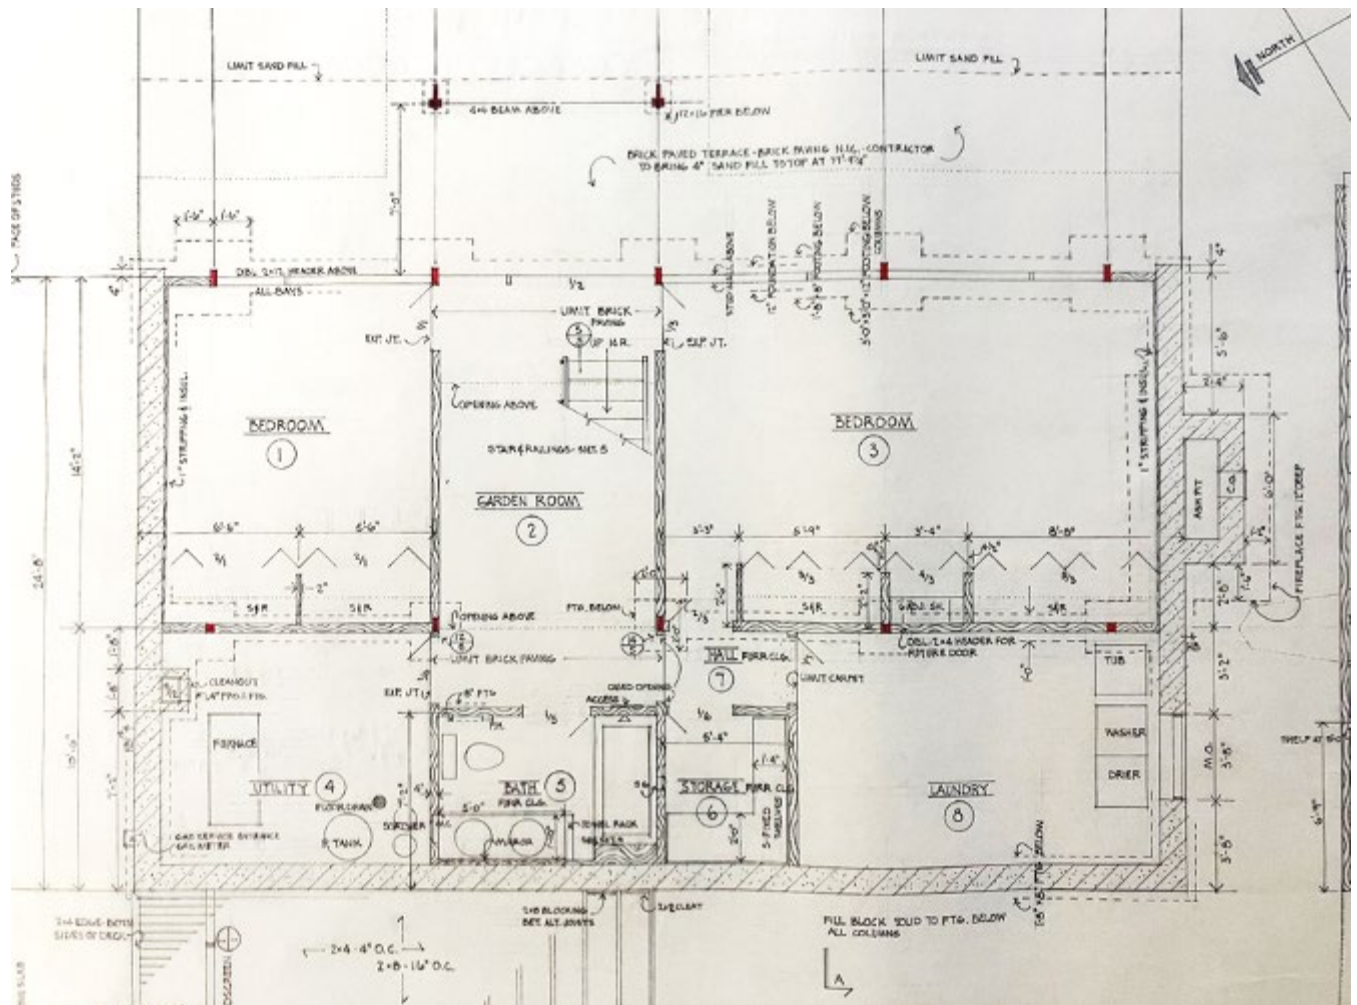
Working drawing, lower level floor plan. Close Associates Papers
